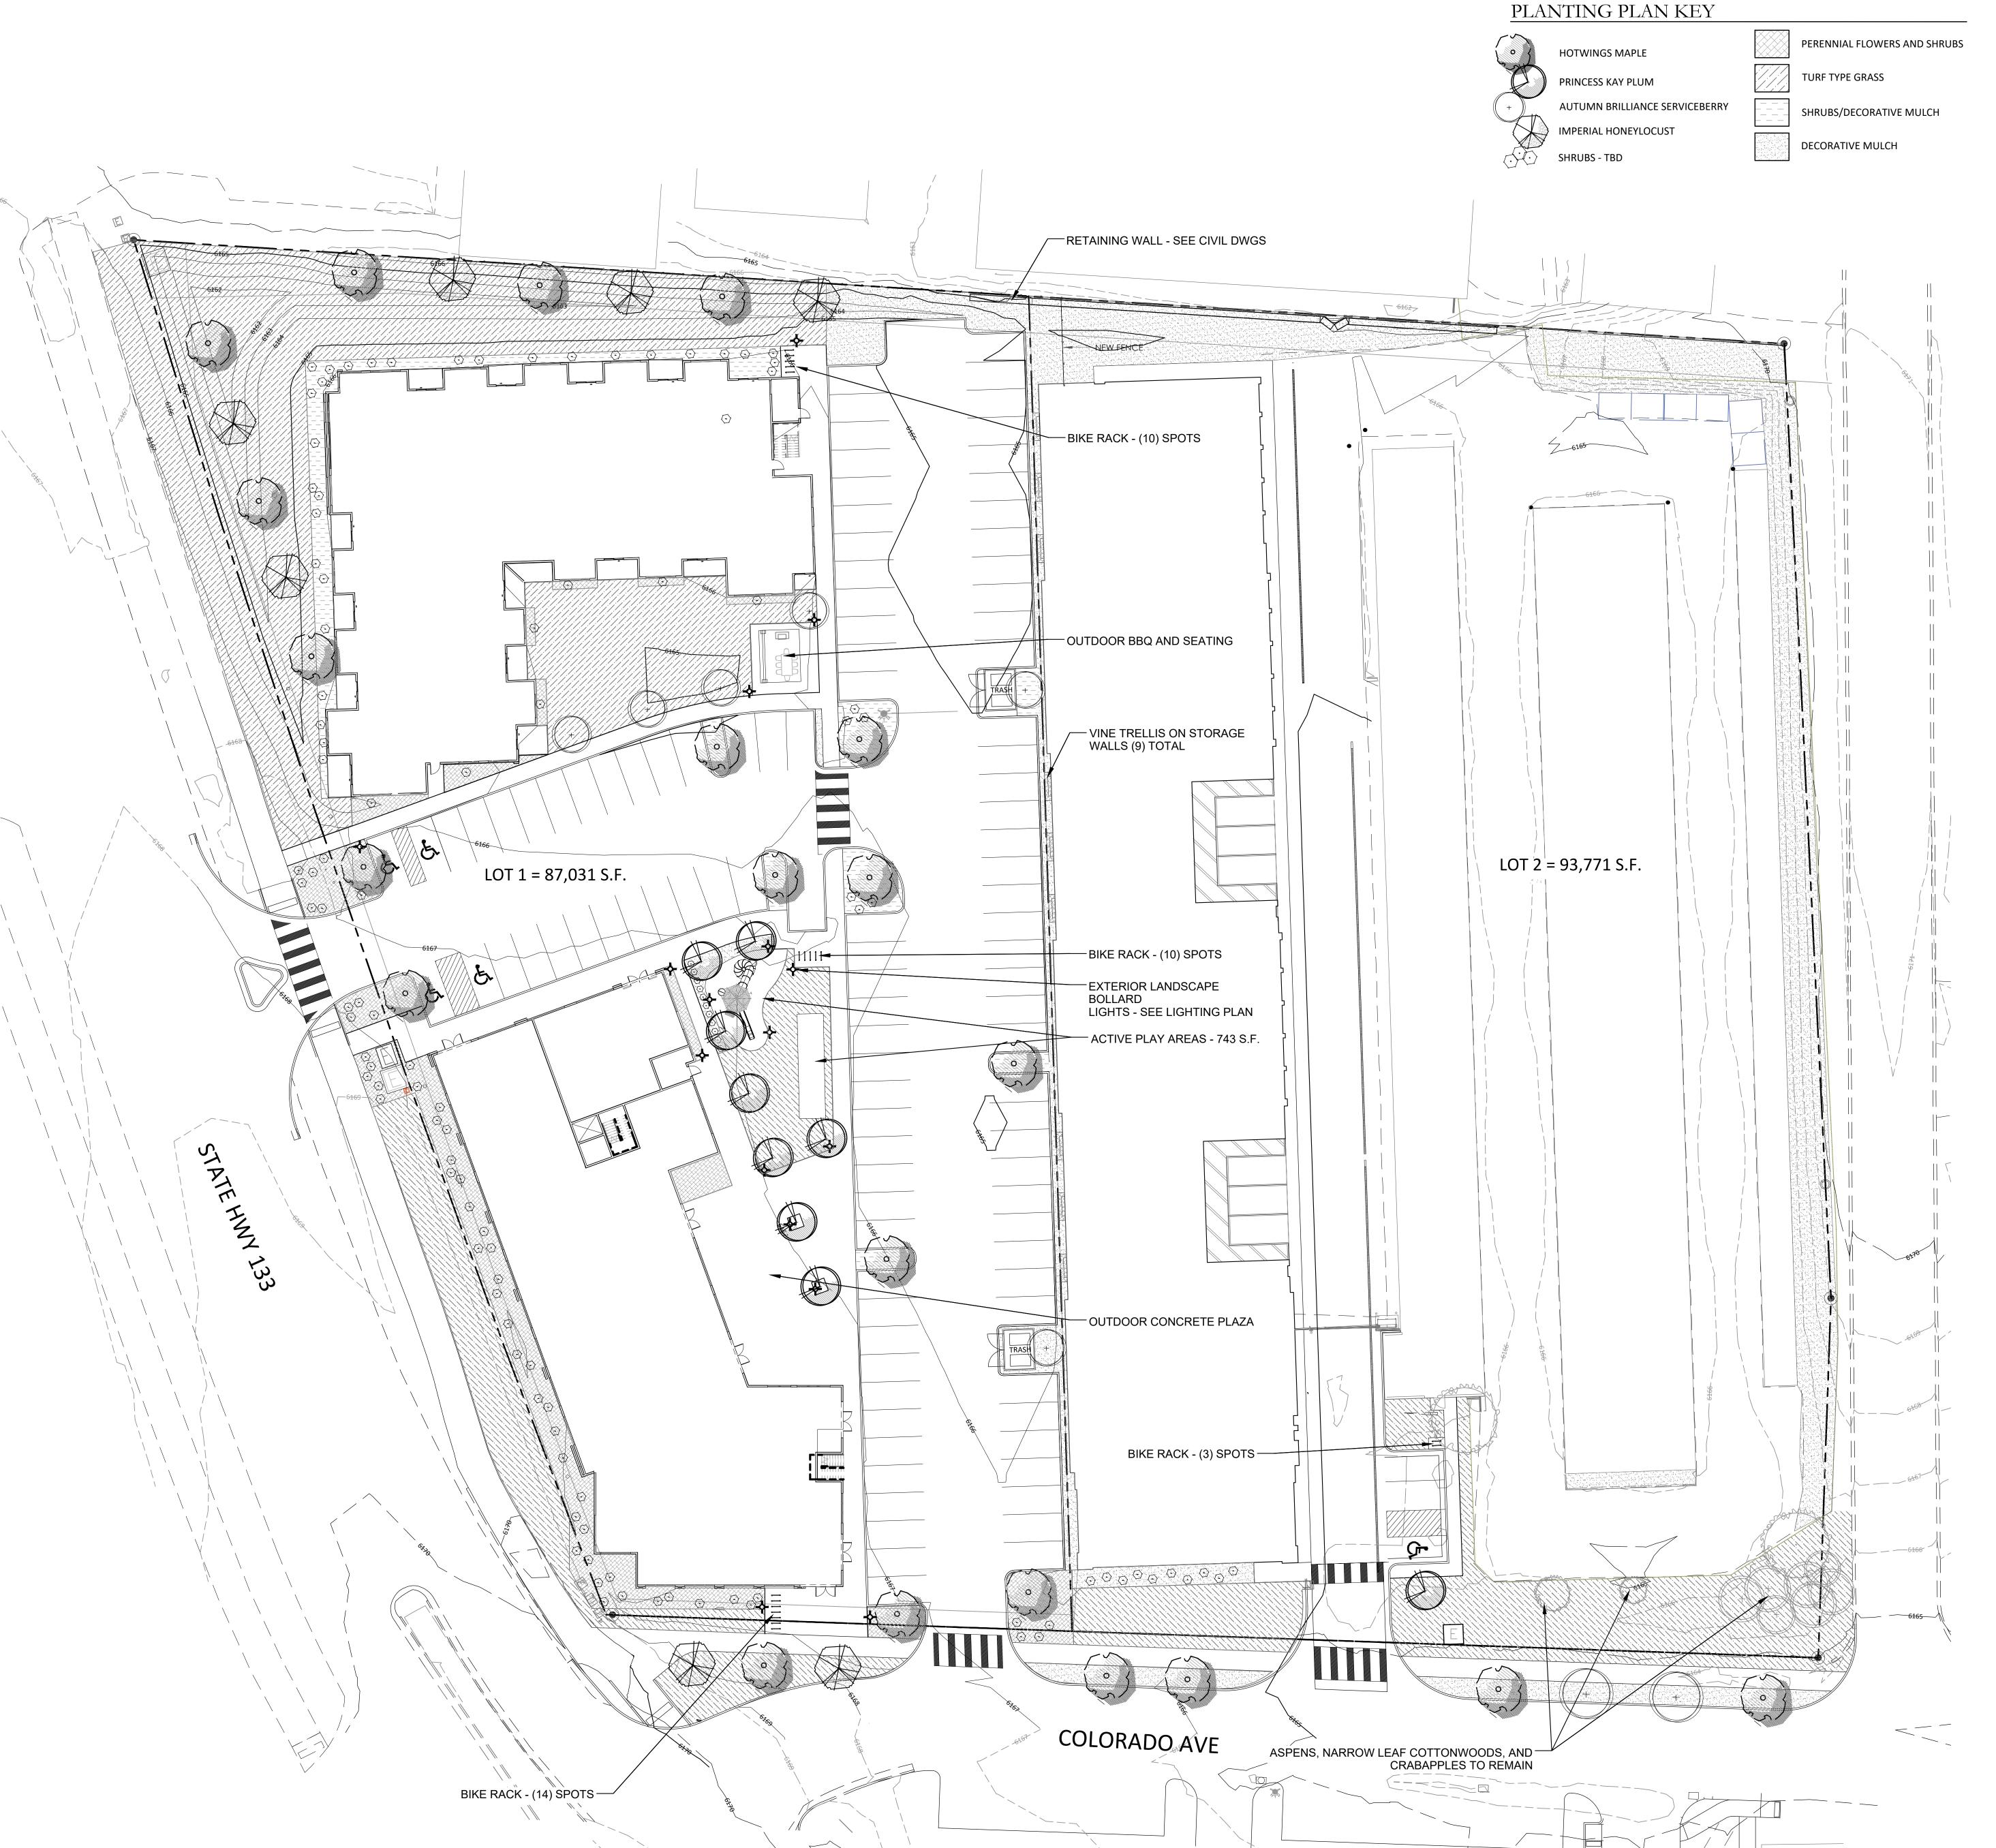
# EXHIBIT G: LANDSCAPE AND IRRIGATION PLAN
